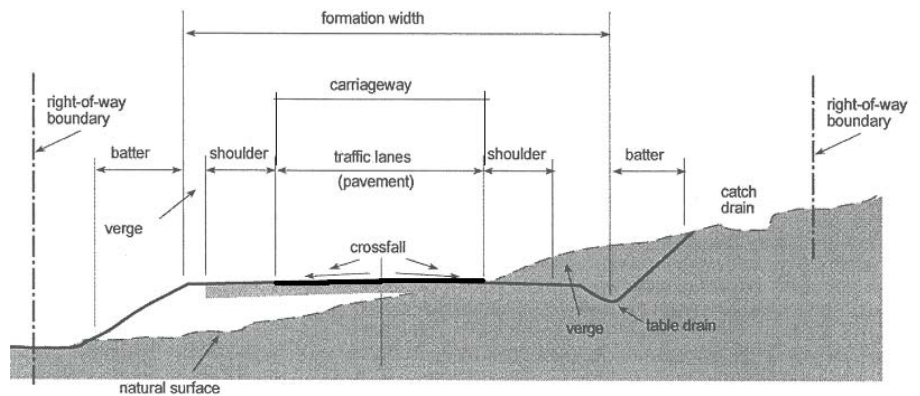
Typical road cross section elements (After Austroads<sup>2</sup>)
